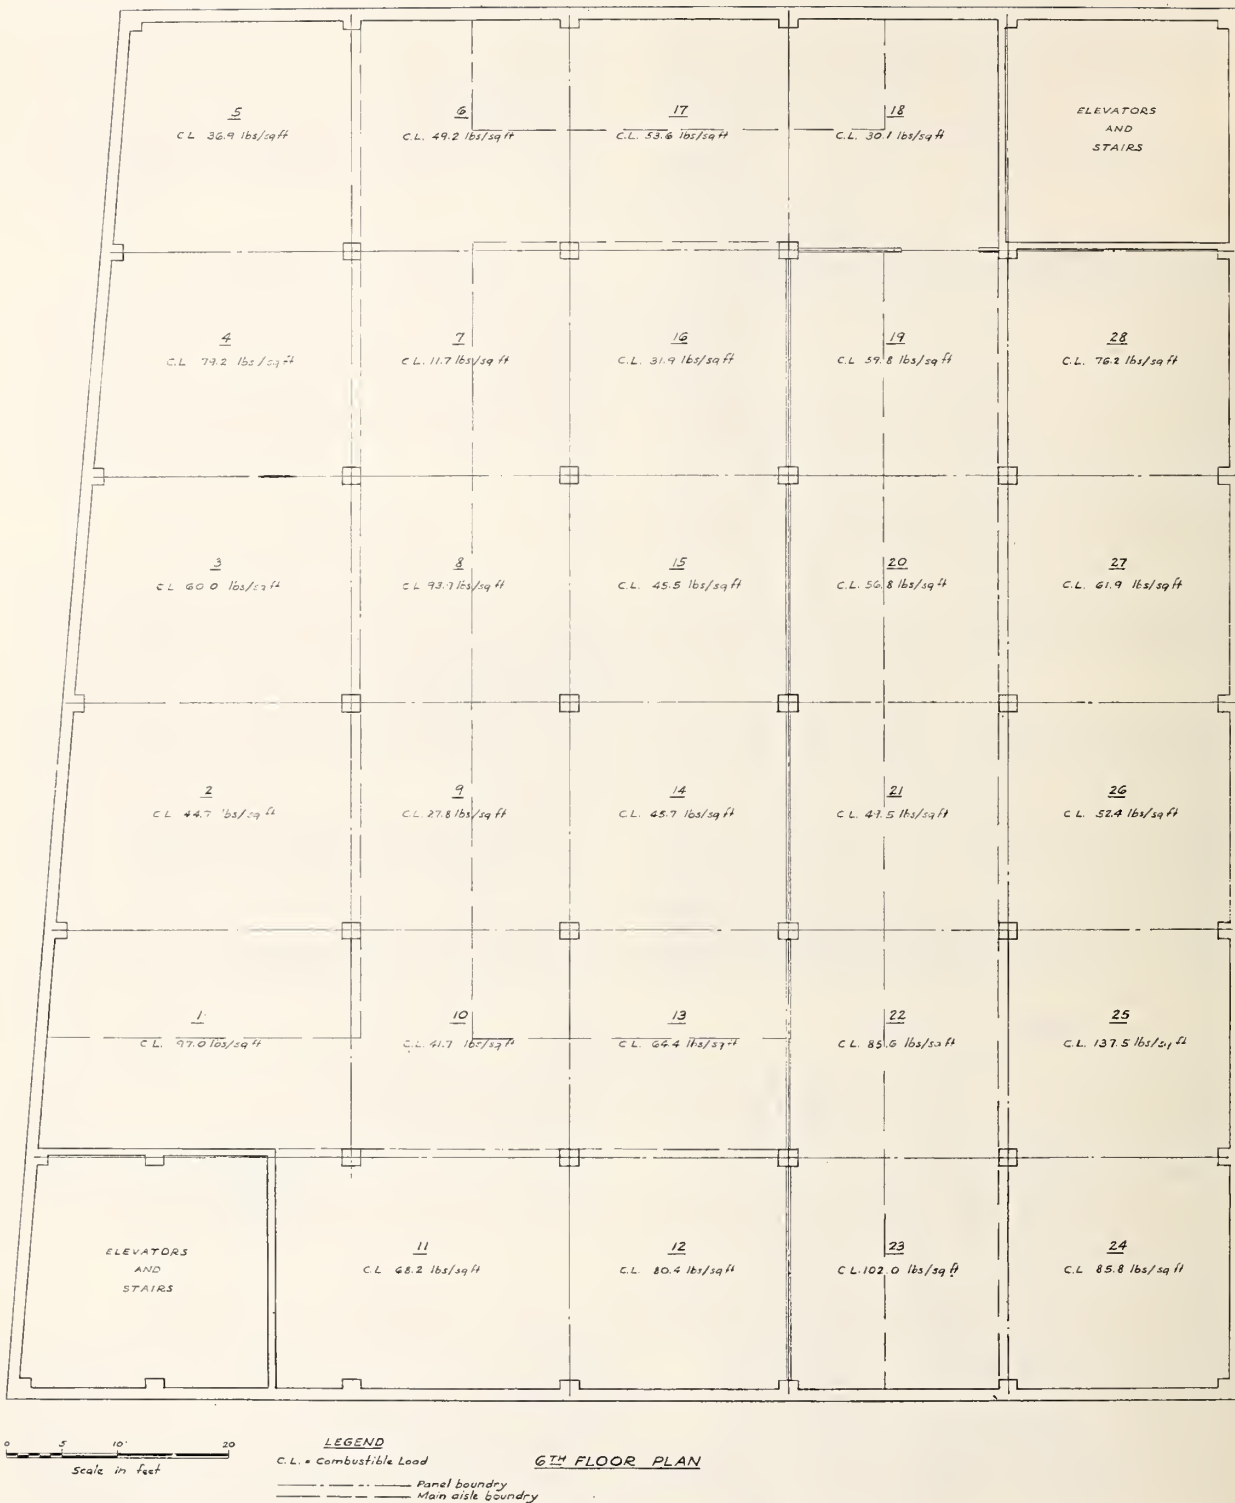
Sixth-floor plan, warehouse, New York, N. Y.
